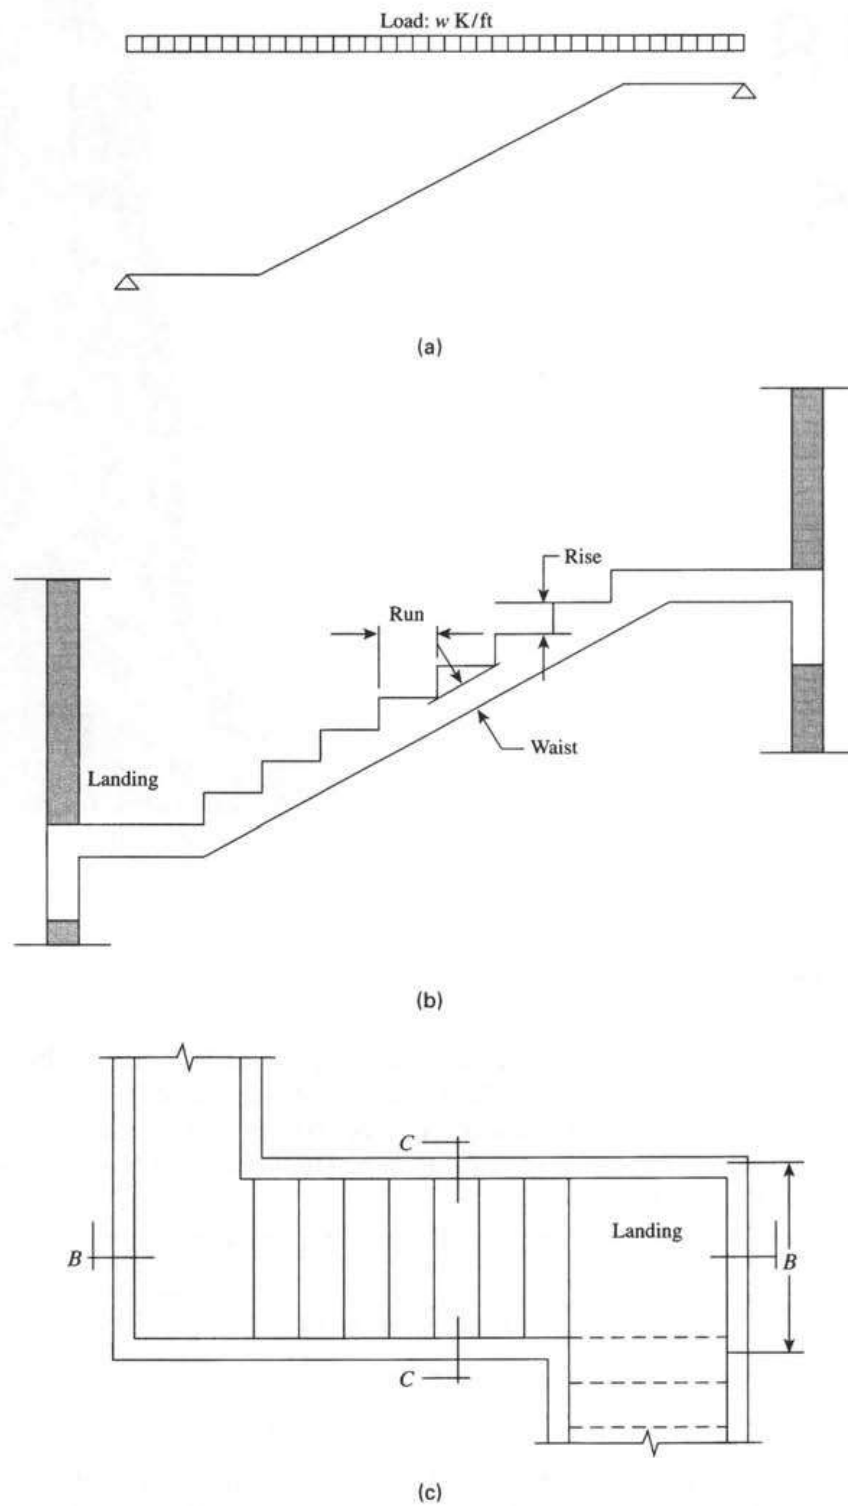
Plan of a single-flight staircase: (a) loads, (b) section B-B, and (c) plan.
